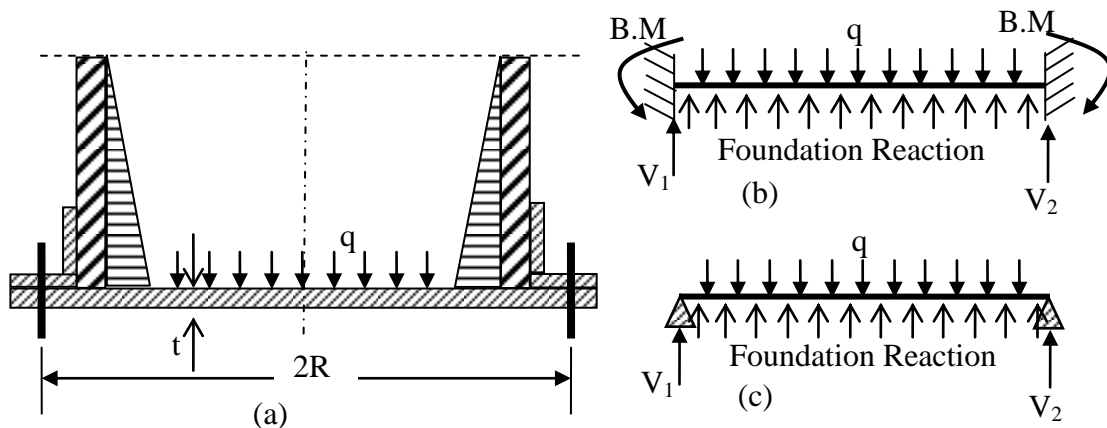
Typical Tank Section and Static Systems. a) Typical Tank Cross Section, b) Fixed Connection, and c) Simple Connection
